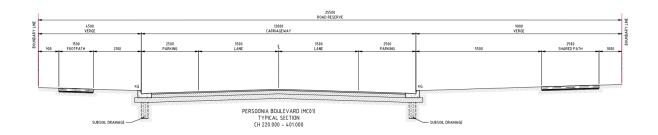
Persoonia Boulevard proposed cross section (southern side of site)
